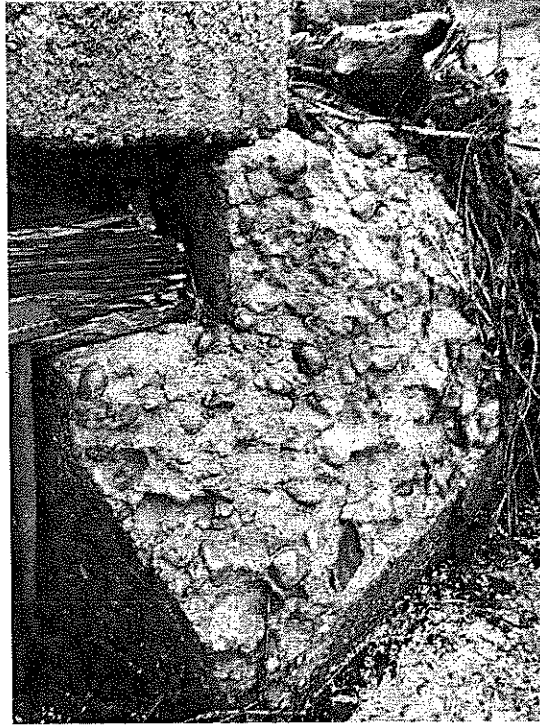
Close up view of concrete spalling and timber deterioration located on the right side of the spillway.
